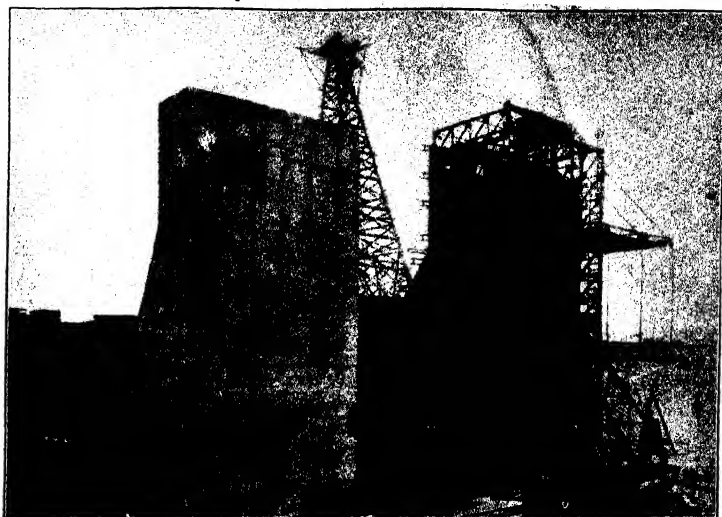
Heavy steel forms for walls on lock at Lockport, Ill.
